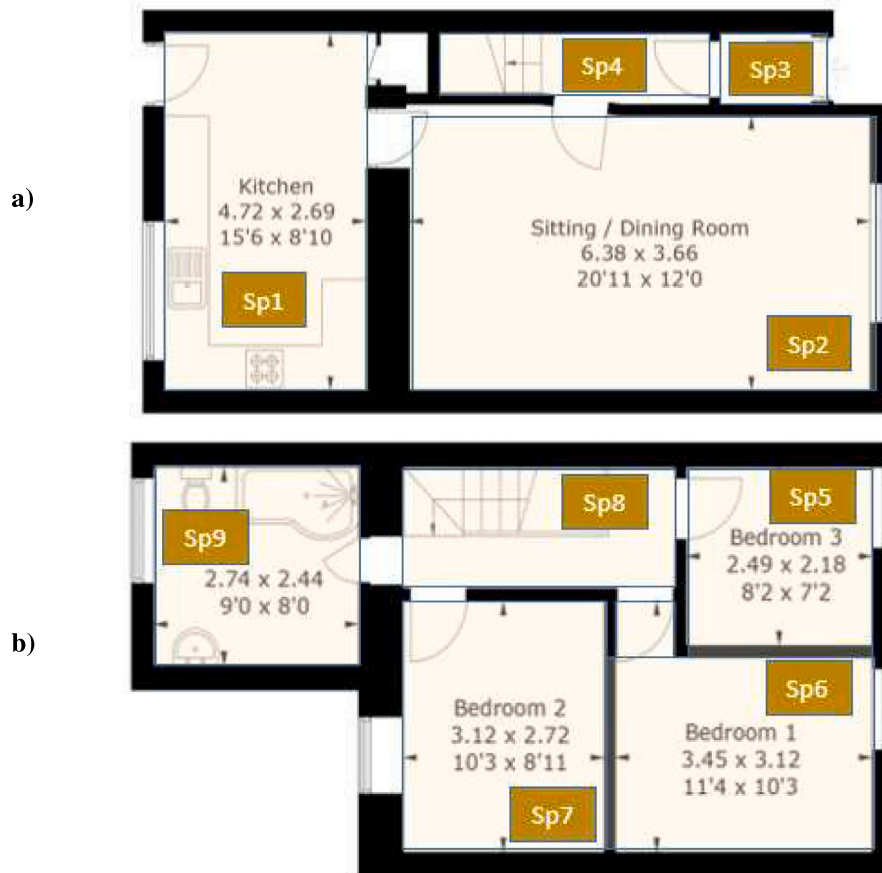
Layout of the residential house [40]: a) Ground floor. b) First floor.
